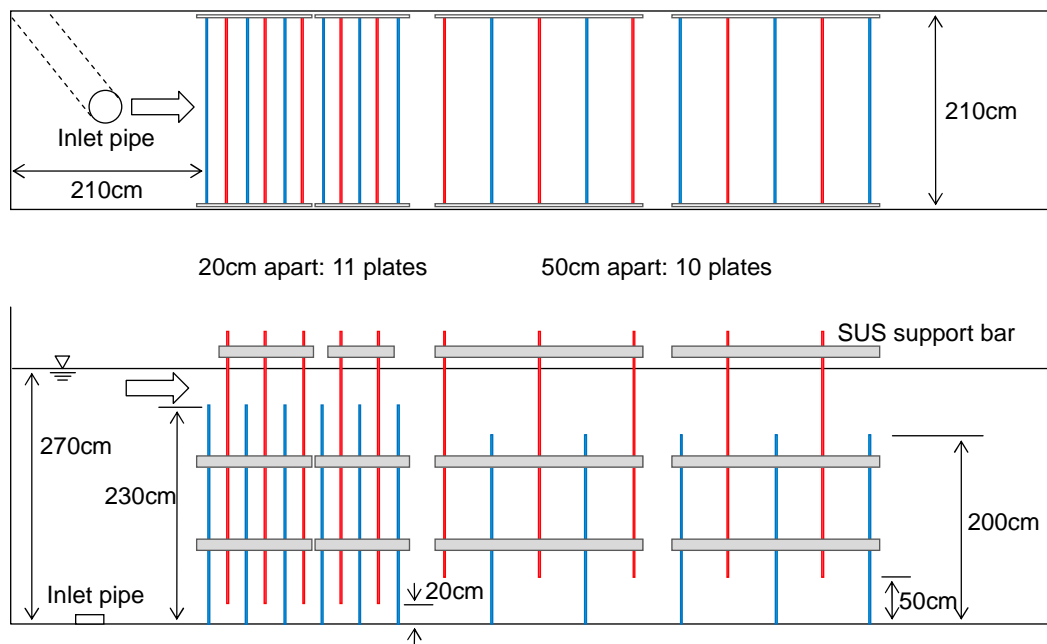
Baffled Mixing Unit Drawing (Upper: plain view, Lower: sectional view)
